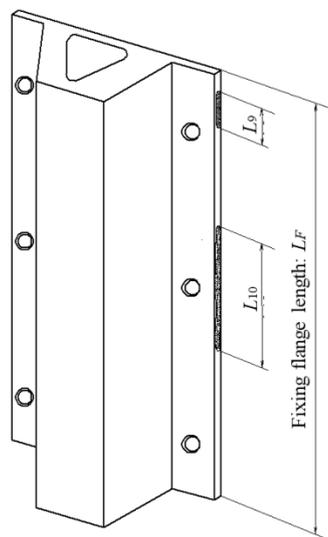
Damage measurement (Separation-Single flange)
